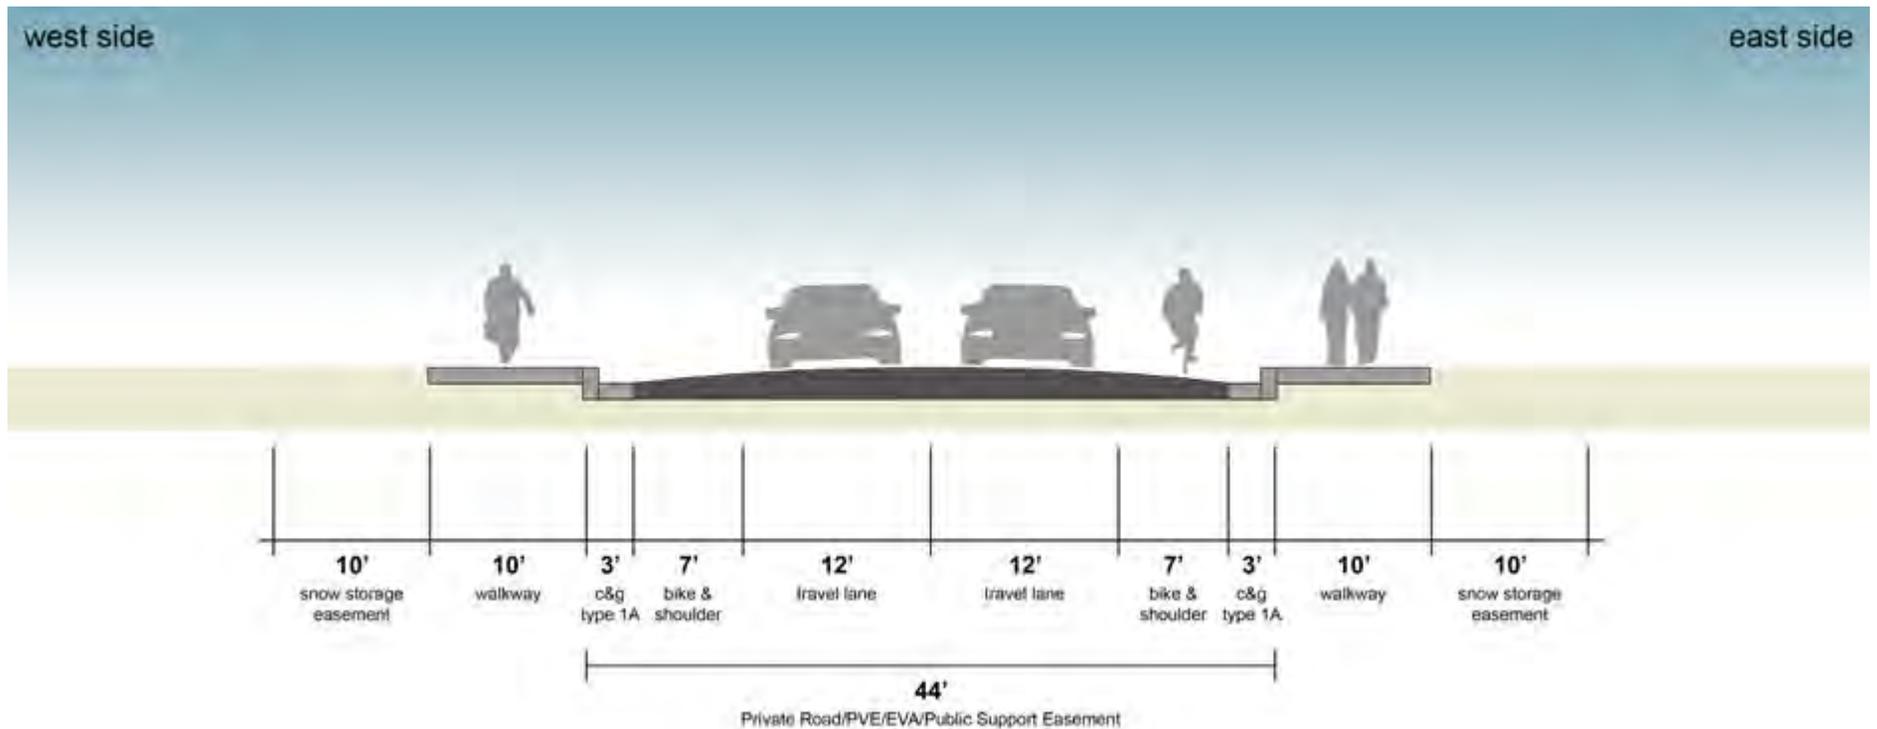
SECTION D: VILLAGE EAST ROAD
